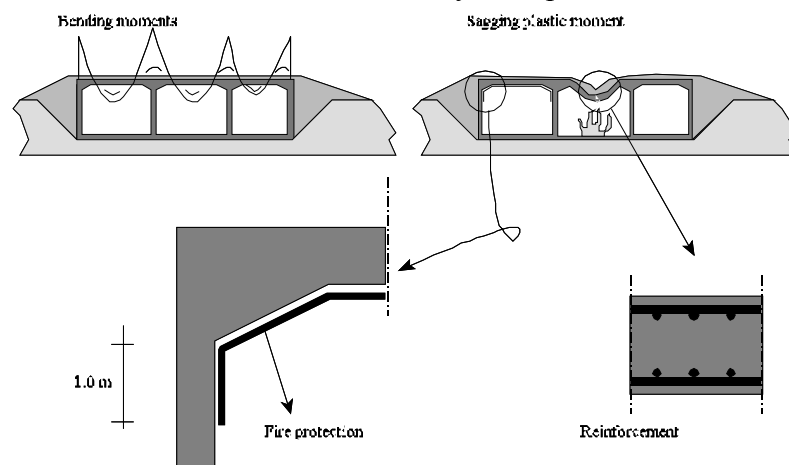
Protection of roofs and upper parts of the walls of immersed tunnels to limit the probability of structural collapse of the roofs in the case of fire.
